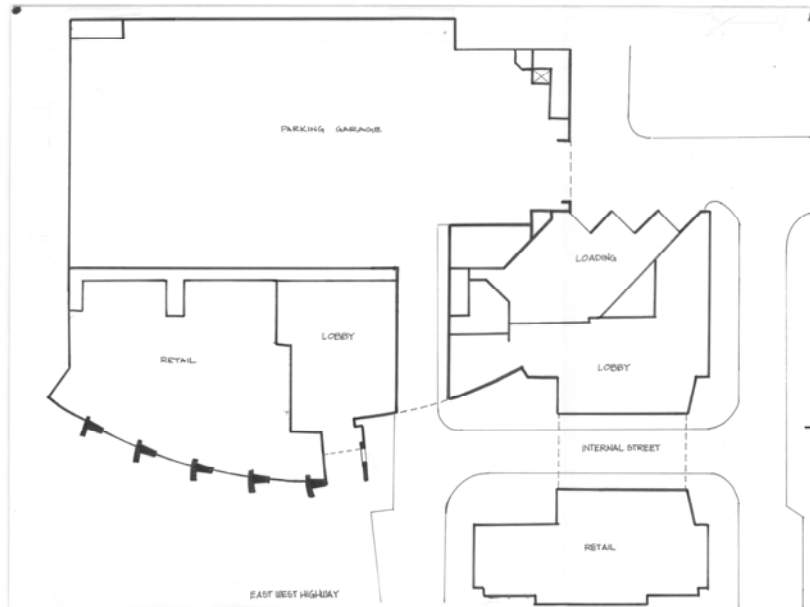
First Floor and Overall Site Plan showing overall shape for lower floors.
